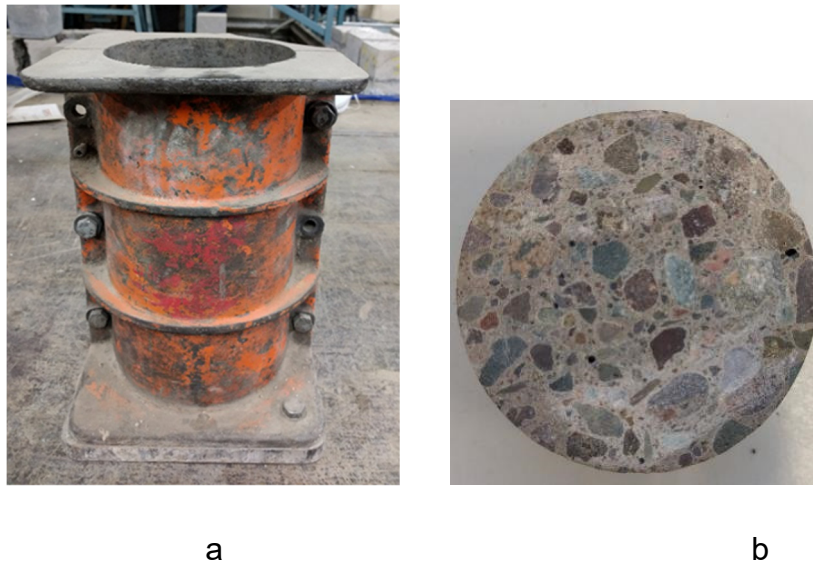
(a) mould used to cast concrete cylinders, (b) concrete disc used for interface testing
